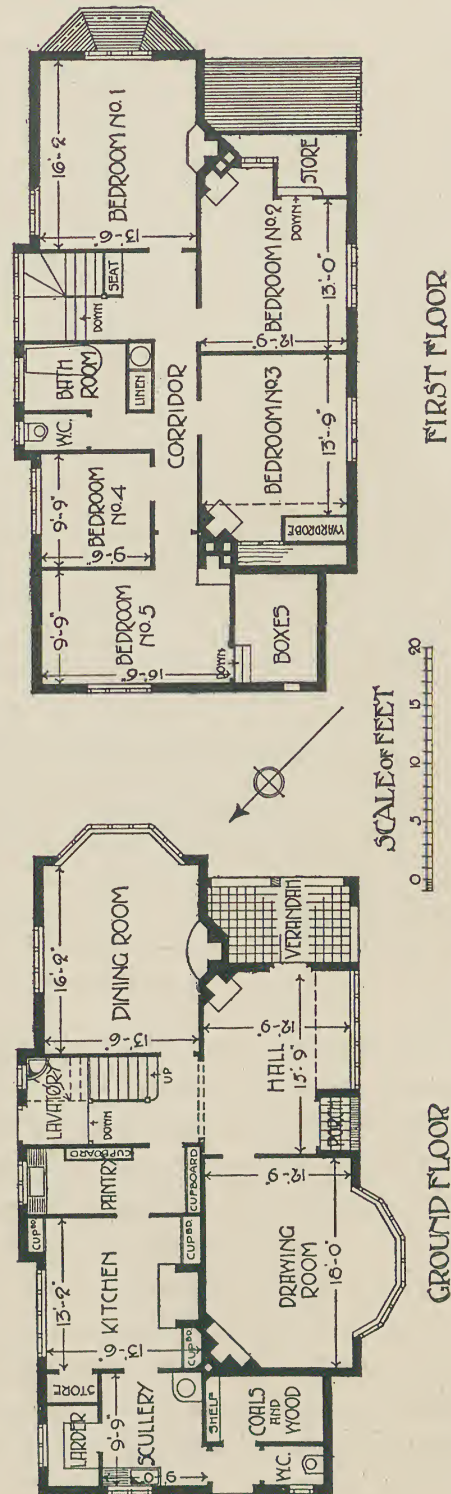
Plans of House with "Square" Hall and Two Sitting-rooms
